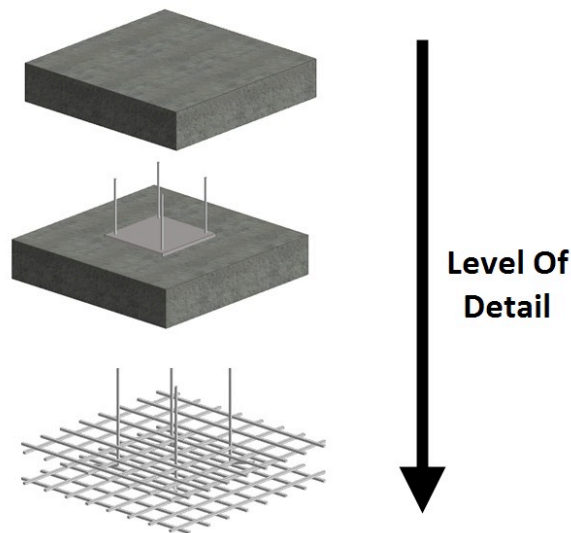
Level of Detail example for a Pad Footing element, first represented as a simple block, later refined with rebar and anchor details.
